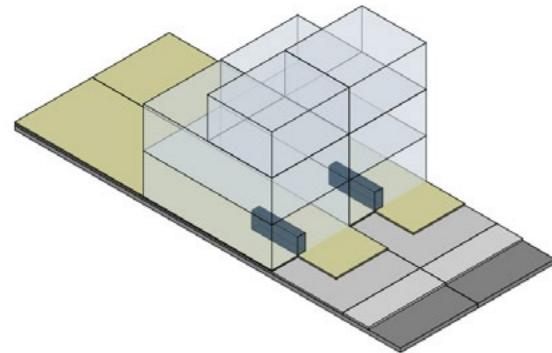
Built into the House - Hallway/ Entrance Porch
